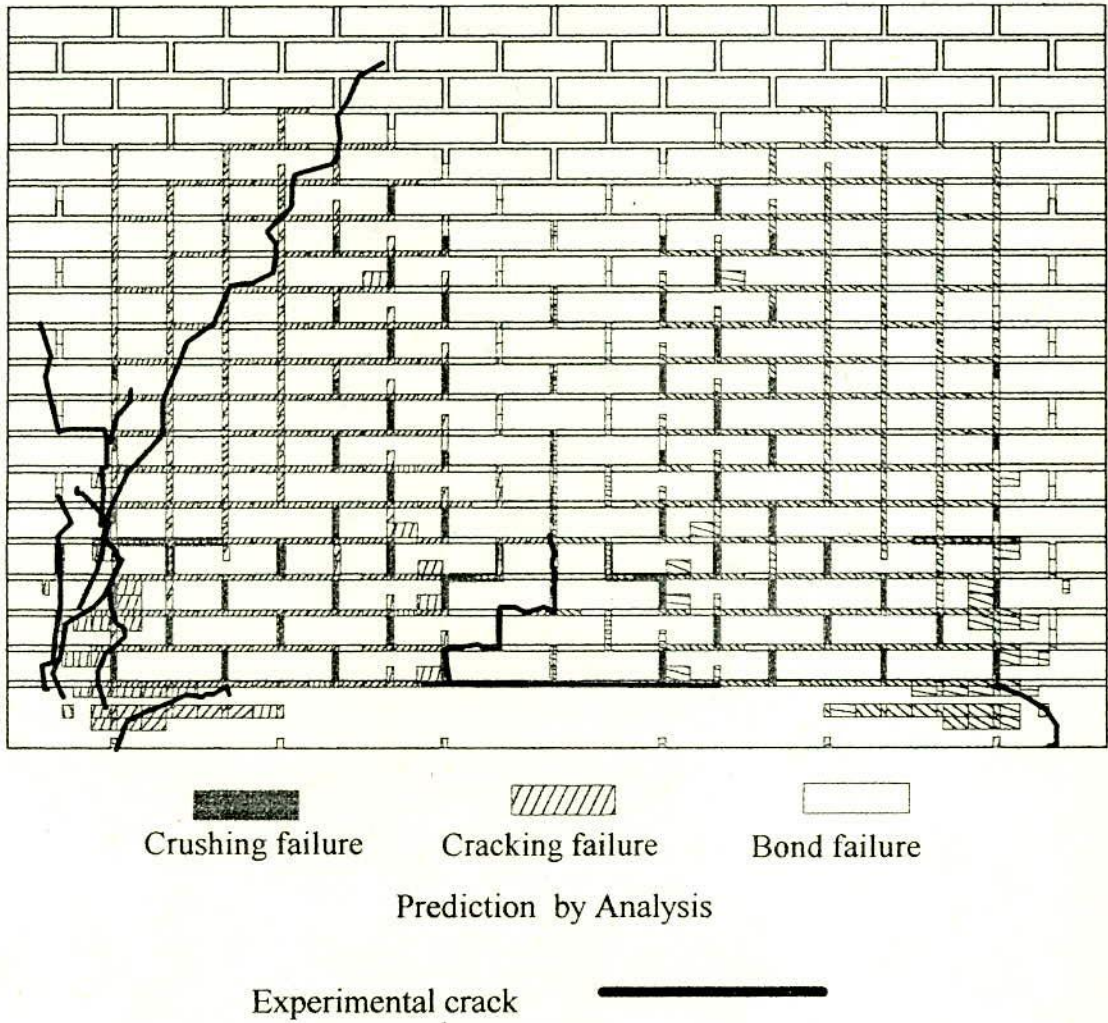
(a) Modes of Failure of Plane Wall-beam Panel
